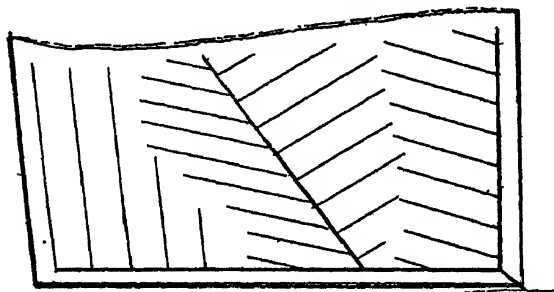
PLAN OF DRAINAGE OF A FIELD.
